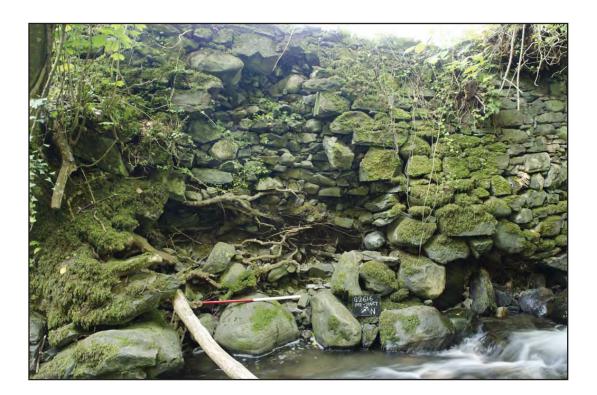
Breached section at wall; scale: 1 x 1m; view from: SE (archive reference: G2616_014).
